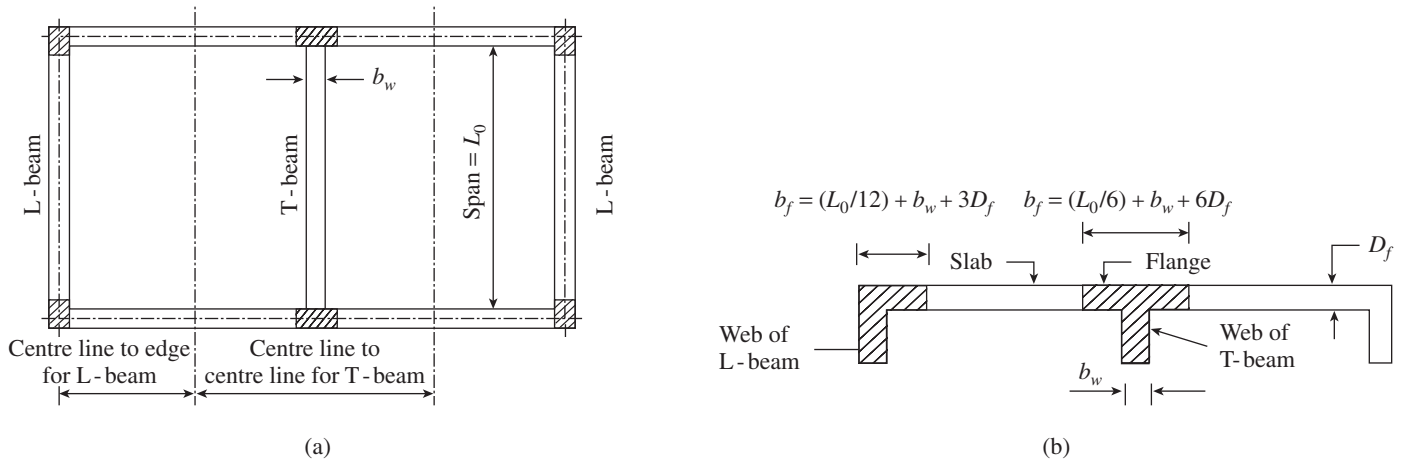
T- and L-beams (a) Plan (b) Section
